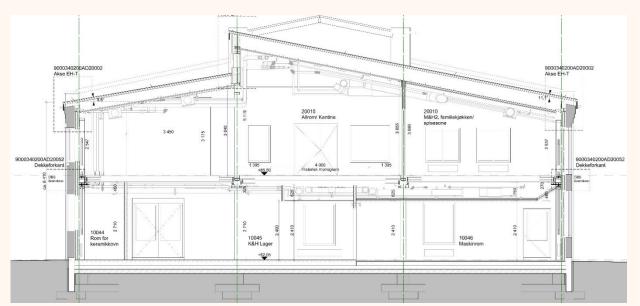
Technical cross section of the H-building. Original image by KONTUR and SPINN Arkitekter.
